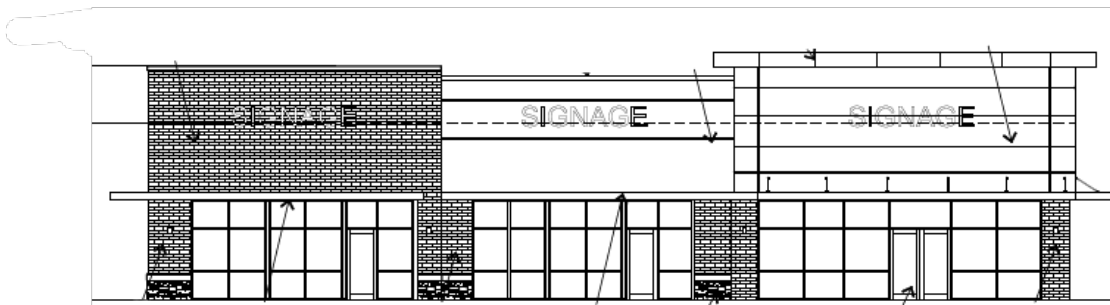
Elevation for the small commercial buildings on Lots 3, 6, and 9.
